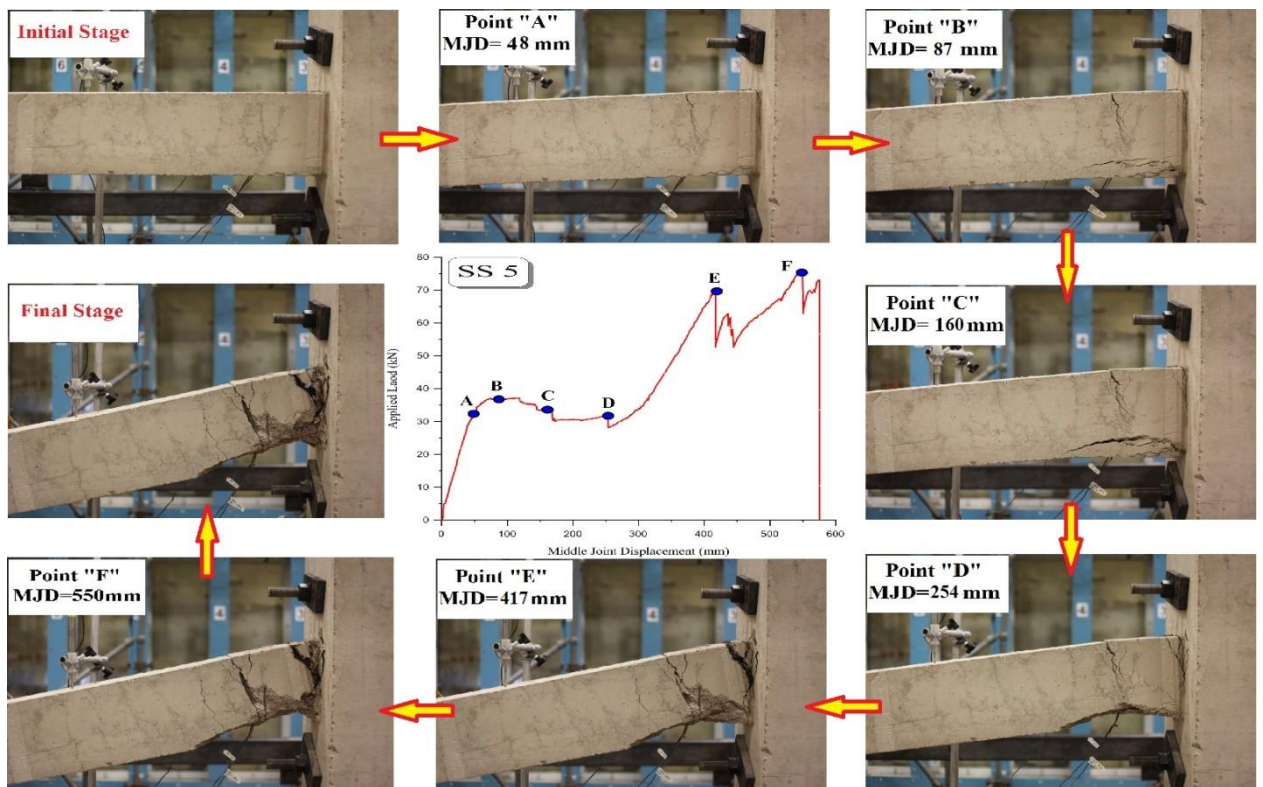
Crack Development at the Left Beam End for Specimen SS-5
